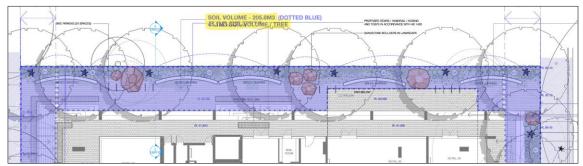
Extract from Landscape Plan – Soil Volume (Dwg. No. LA LP 109 / 02) overlaid on Landscape Plan – Level 01 (Dwg. No. LA LP 101 / 02) from Appendix F Landscape Plans; Soil volume of through site link.
